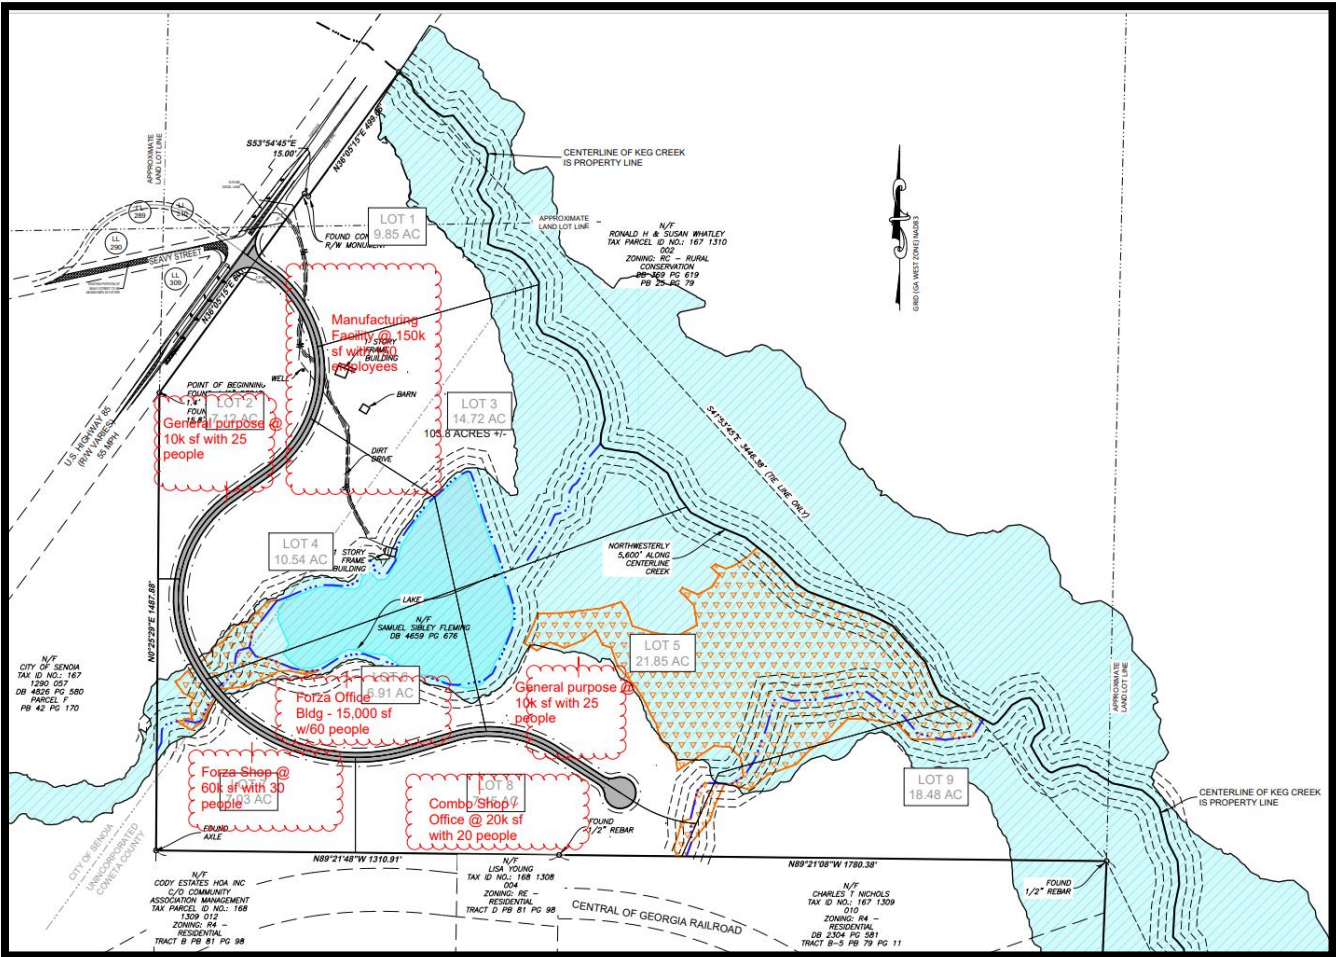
Site Plan for Proposed Forza Manufacturing Development
